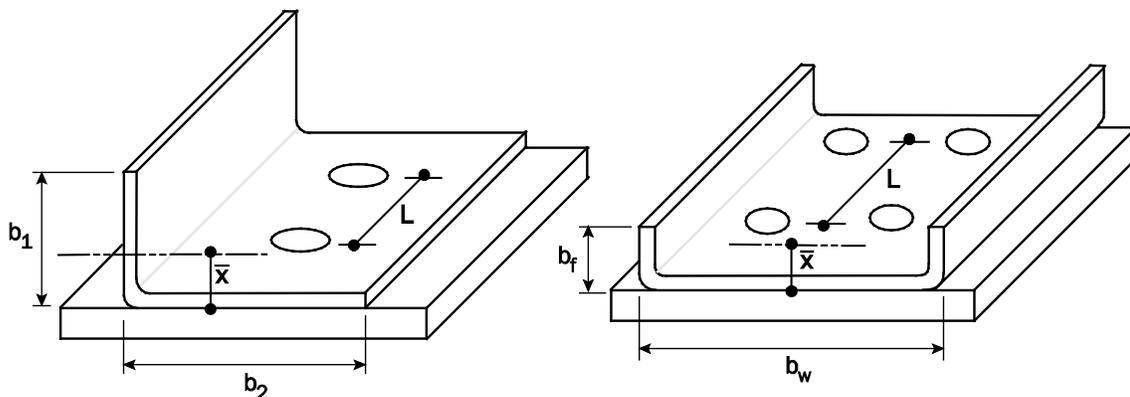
\bar{x} Definition for Sections With Bolted Connections
